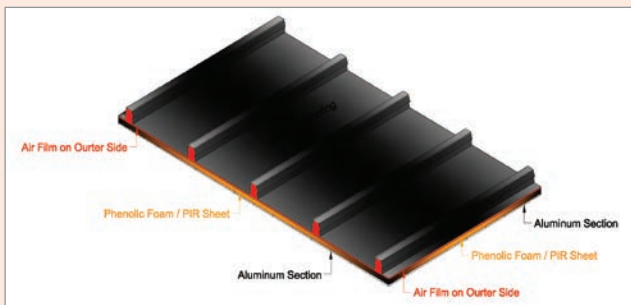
Underdeck insulation with phenolic foam / PIR sheet for metallic roofing
